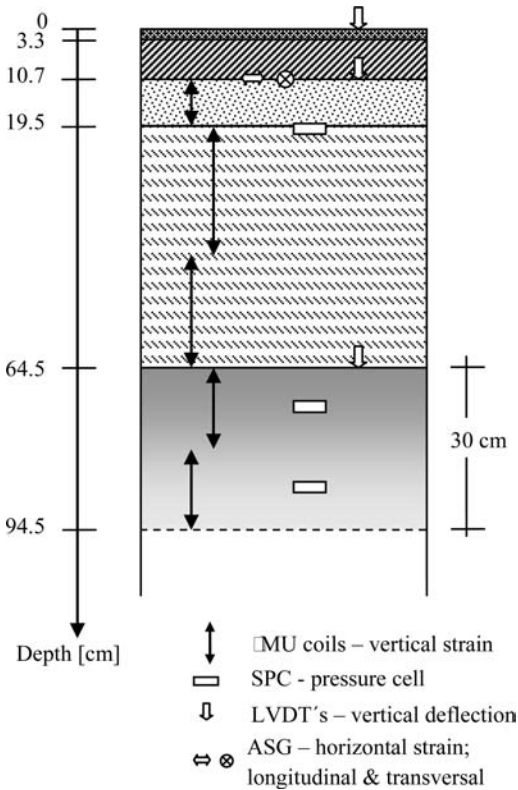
A cross section of pavement structure SE10 as well as the vertical location of the instrumentation.
